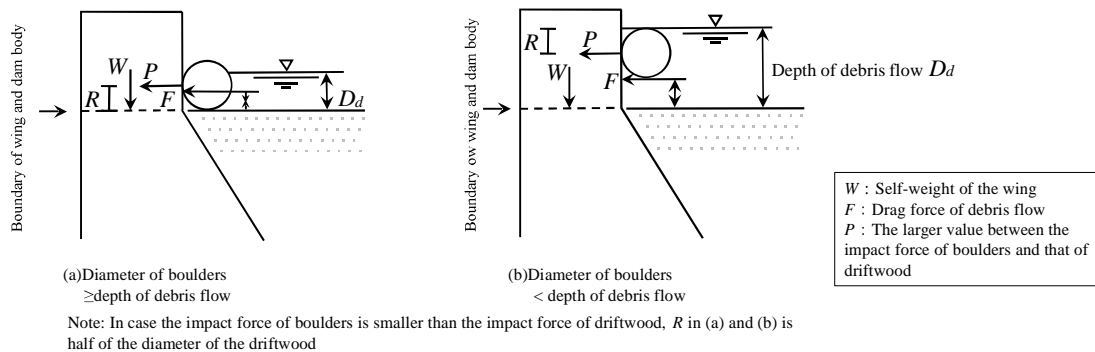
Acting point of design external forces at the boundary between the main dam body and wing
